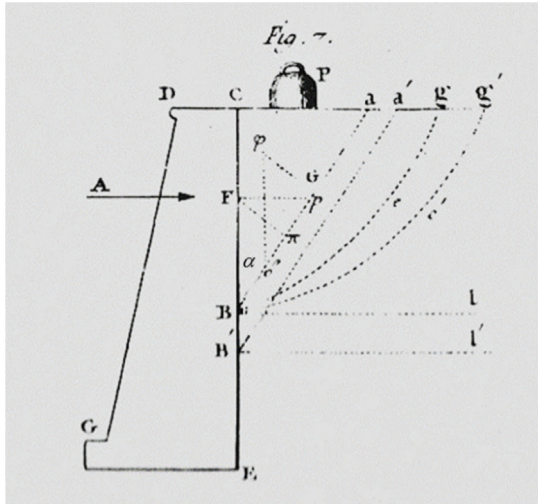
Earth pressure on a retaining wall (Coulomb, 1773)<sup>3</sup>.
